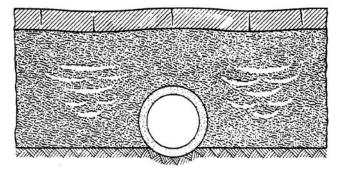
Pavement Failure Due to Inadequate Compaction or Low-Quality Fill Soil Adjacent to Rigid Pipe
